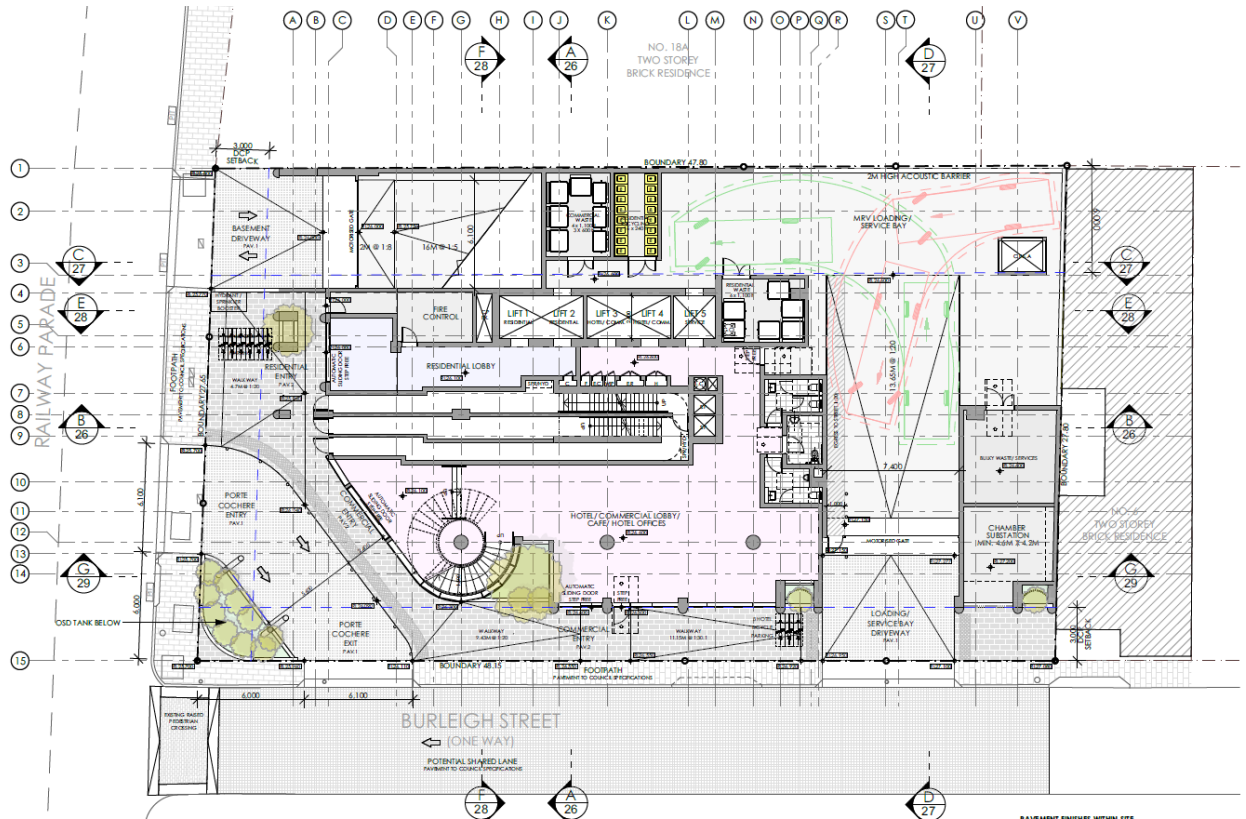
Ground Level Floor Plan prepared by PTI Architecture.
